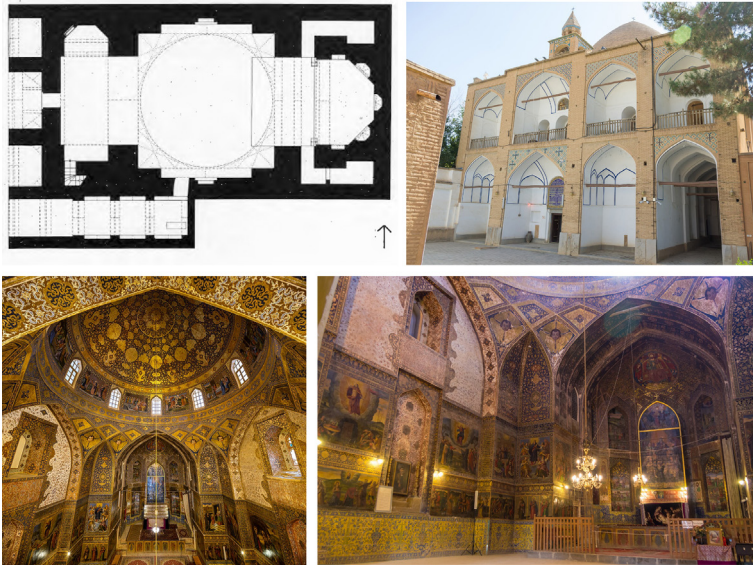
Author, Church of St. Bethlehem: floor plan, exterior view, interior dome, and interior altar. n.d. Photographs and drawing. New Julfa, Isfahan. SHA Archive, copyright
